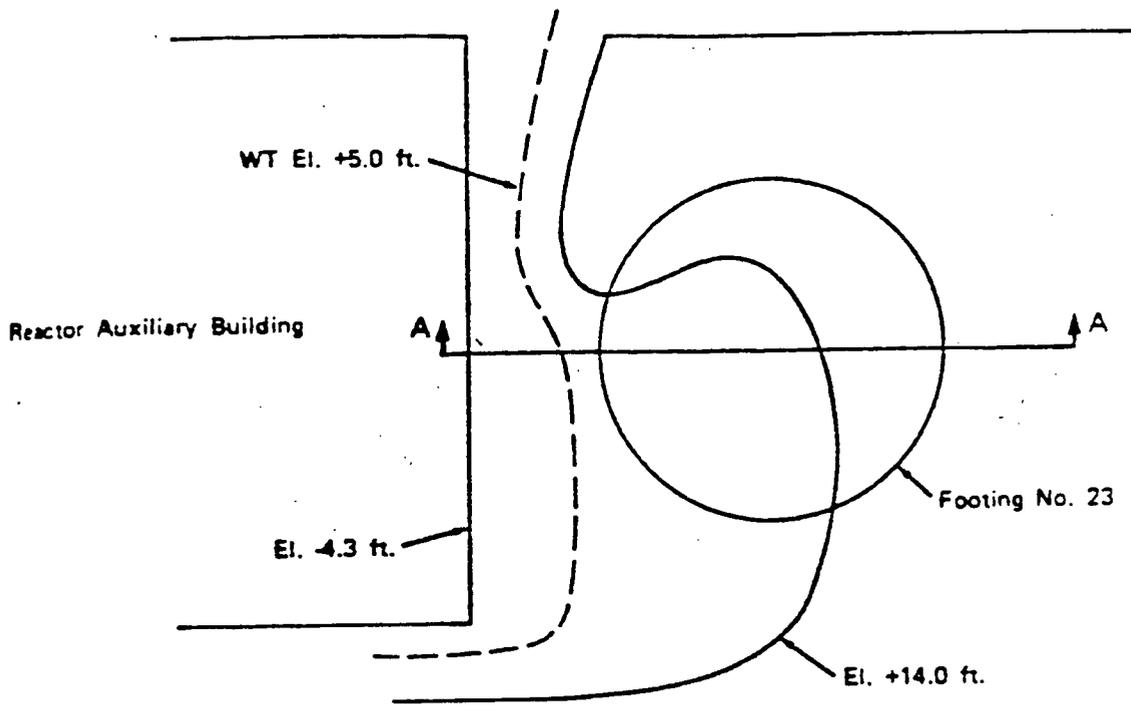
Local Soil Conditions Under Refueling Water Storage Tank, Item No. 23
